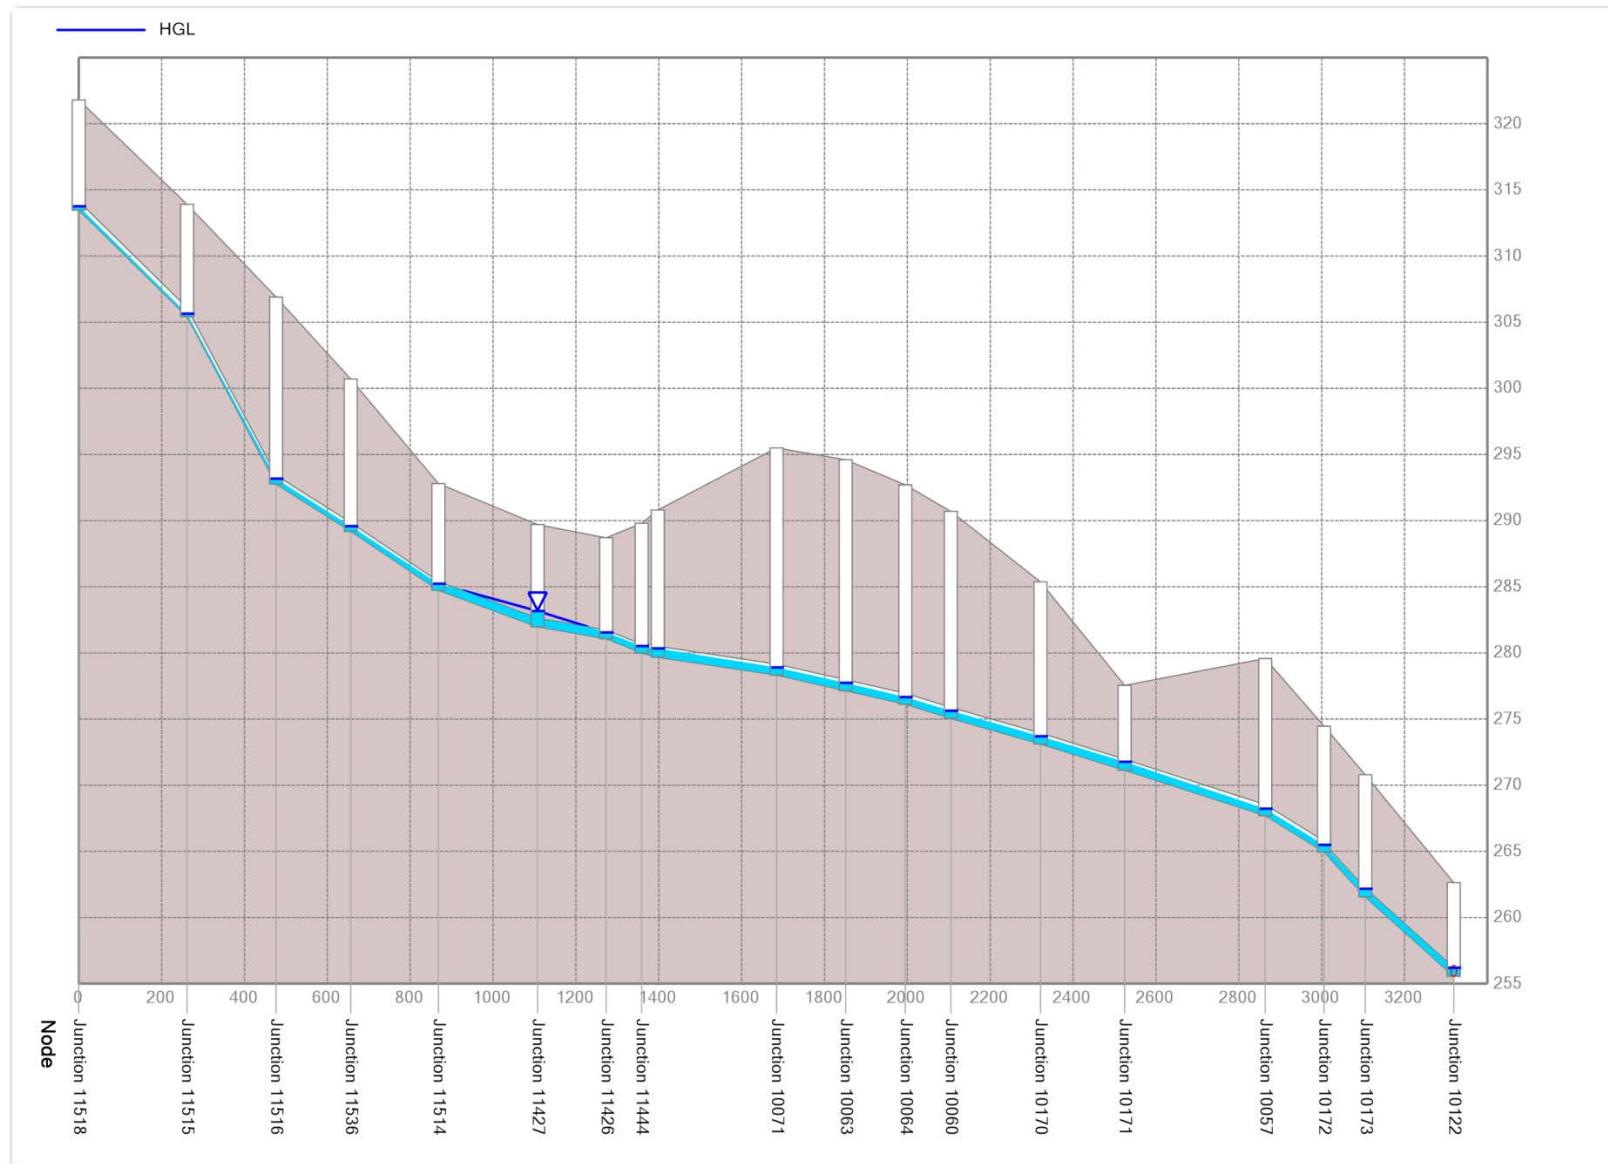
13th and Division Street sewer profile, 1- in 10-year storm event, pipes upsized
